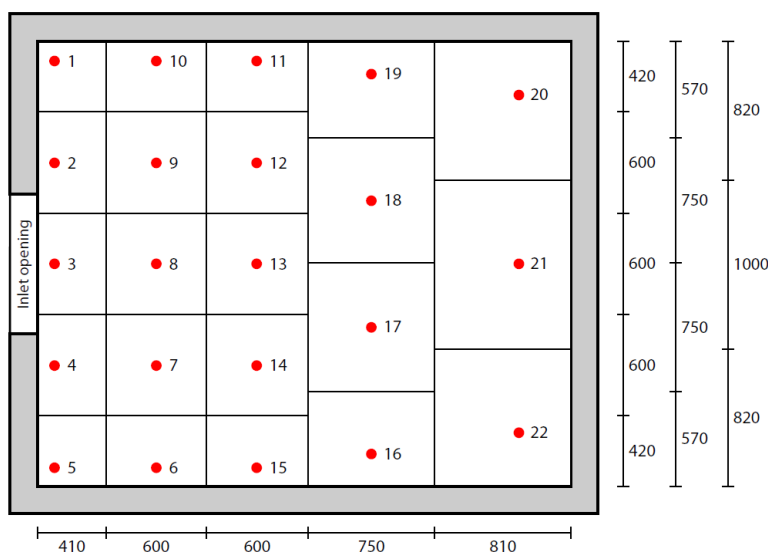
Ceiling element divided into 22 sections. All units are in mm.
